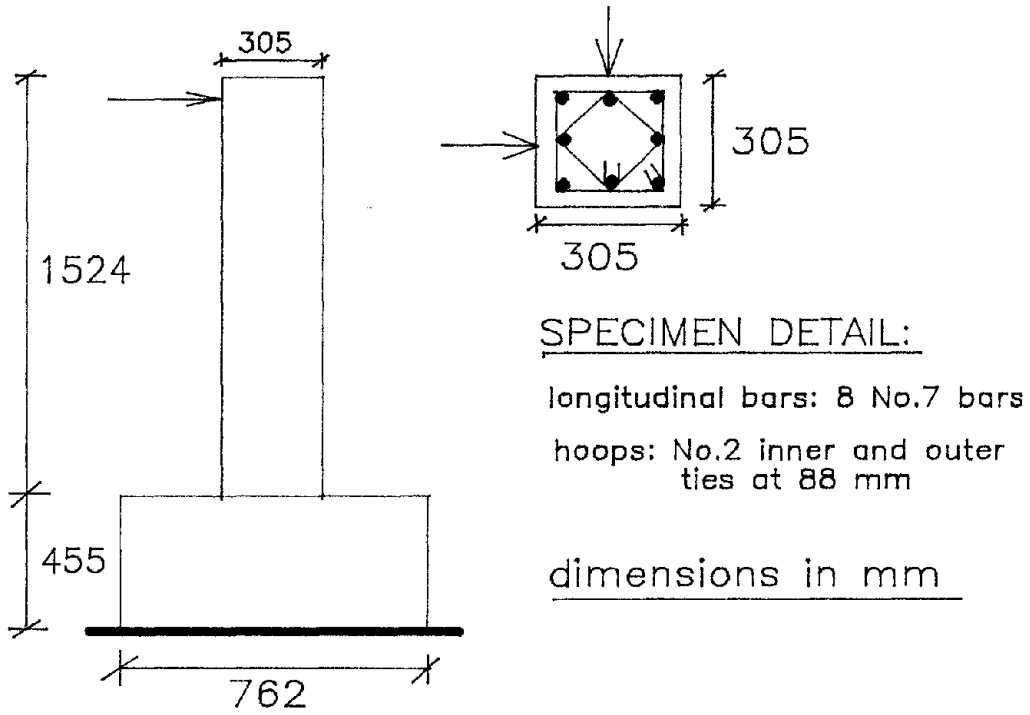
Specimen Details and Loading Path for Biaxial Test (Lai, 1987)
